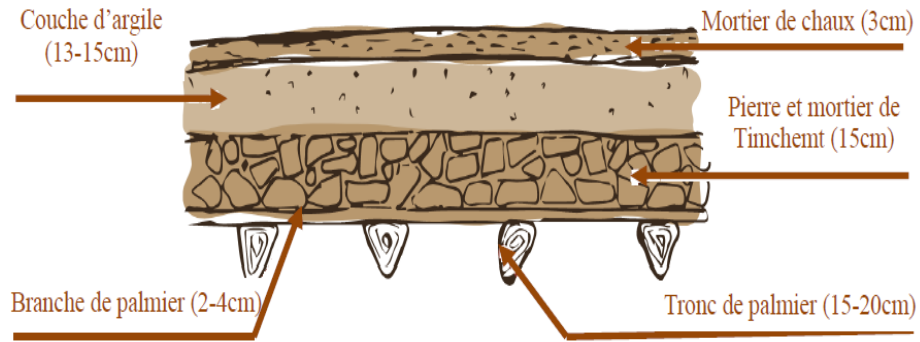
Cross-section of a roof made of palm trunks and branches (case study) [70]
